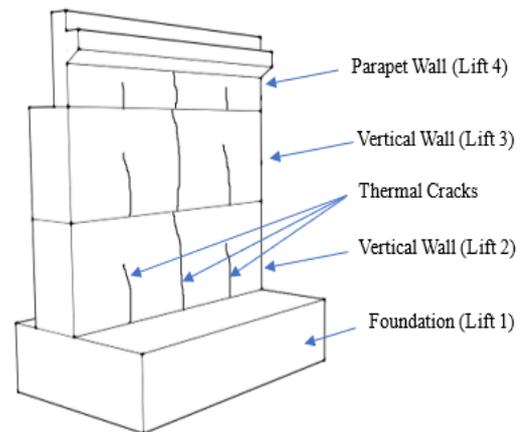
Typical example of abutment with multiple lifts and thermal cracks
